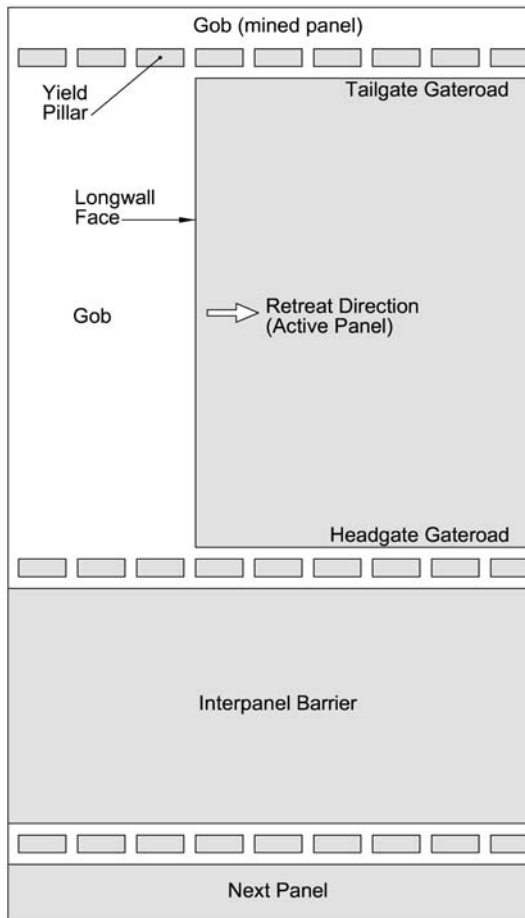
Plan of Panel-barrier Layout Using a Two-entry Yield Pillar Gateroad System
